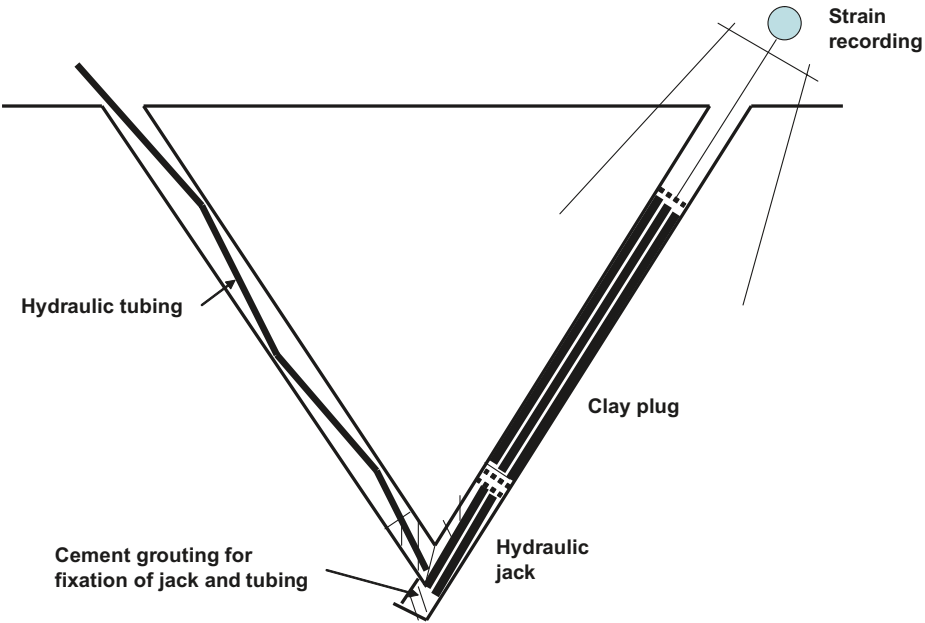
Arrangement for measuring clay/rock adhesion by extruding the plugs in the 5 m long holes and measuring the displacement.
